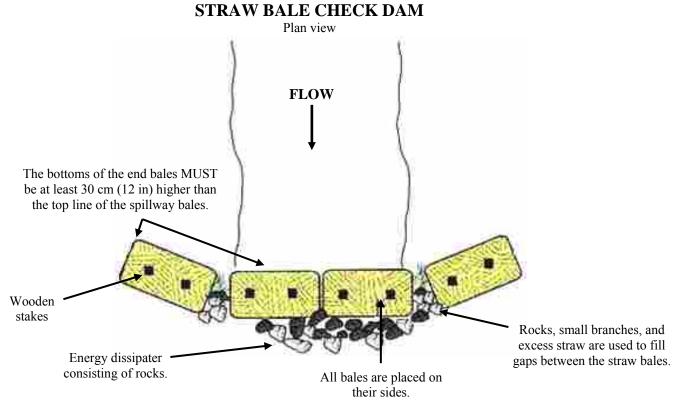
Plan view structural diagram of straw bale check dam structure modified from Napper (2006). Straw bale check dam structures open up-channel.
